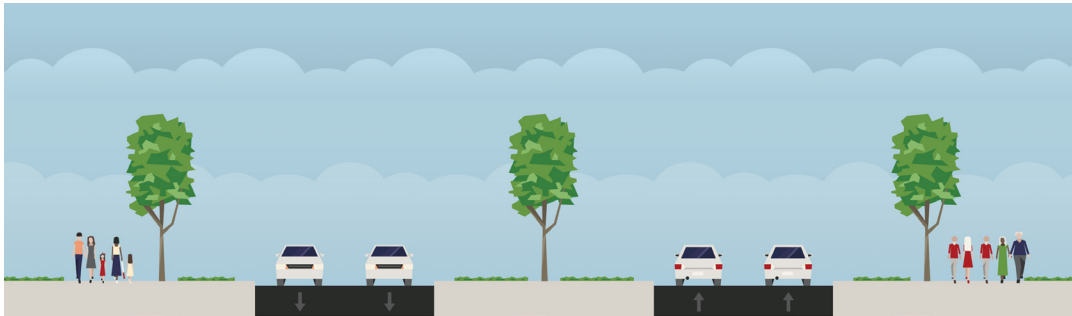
Alternative 4 Typical Cross-Section and Aerial View
